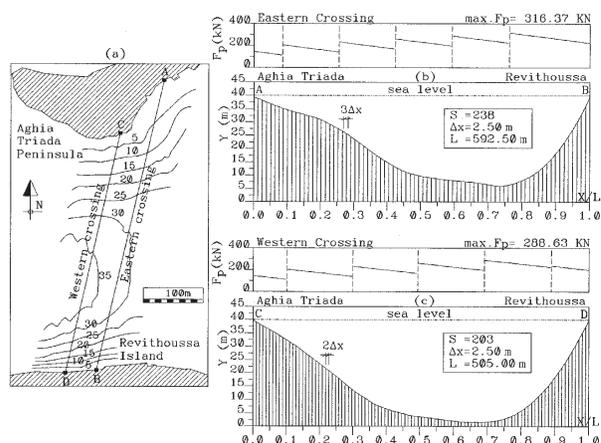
Revithoussa project area plan (a); final seabed profiles and pulling force variation along subsea route for Eastern (b) and Western (c) crossings
